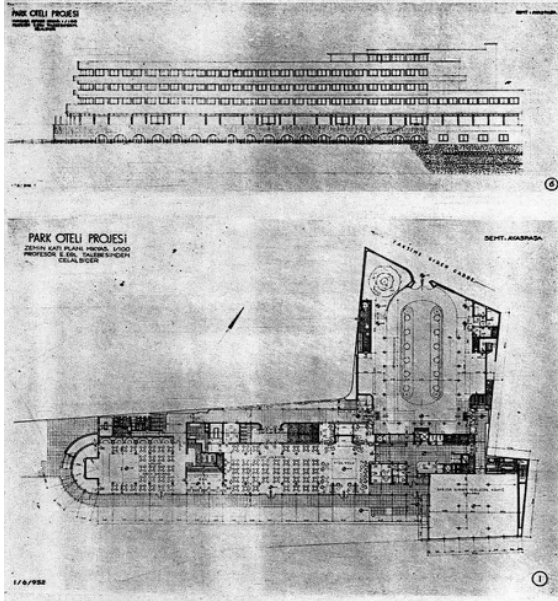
Park Hotel Project, Façade and ground floor plan, student: Celal Biçer, (Anon., 1932).
